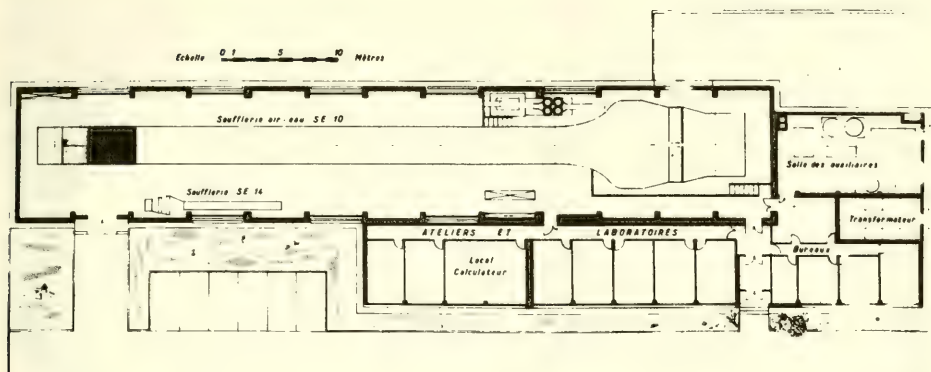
Air-Sea Interactions Laboratory Floor Plan
